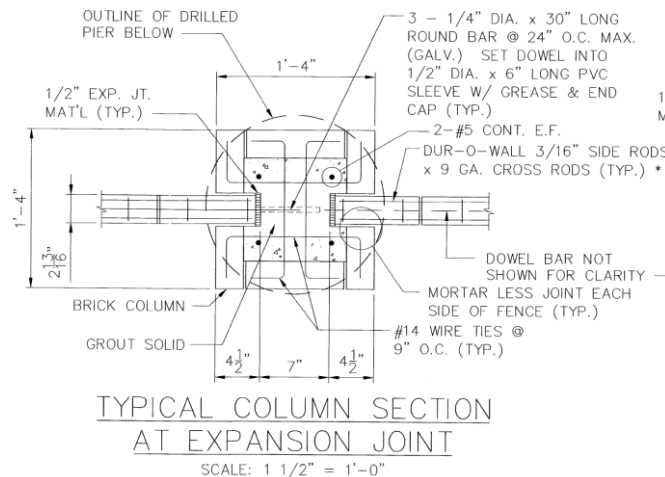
Detail from original design drawings showing the design of expansion joints on both sides of a column.
